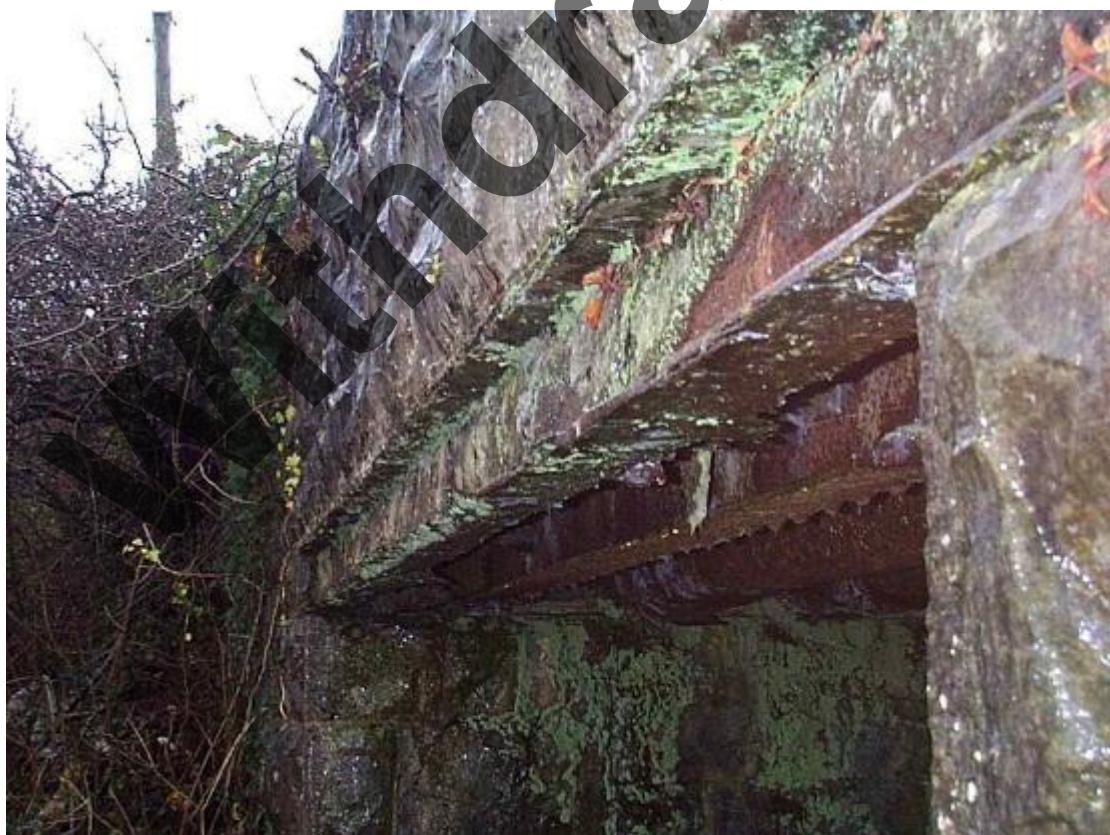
Component No.11 Beams/Girders - Condition Rating 3
